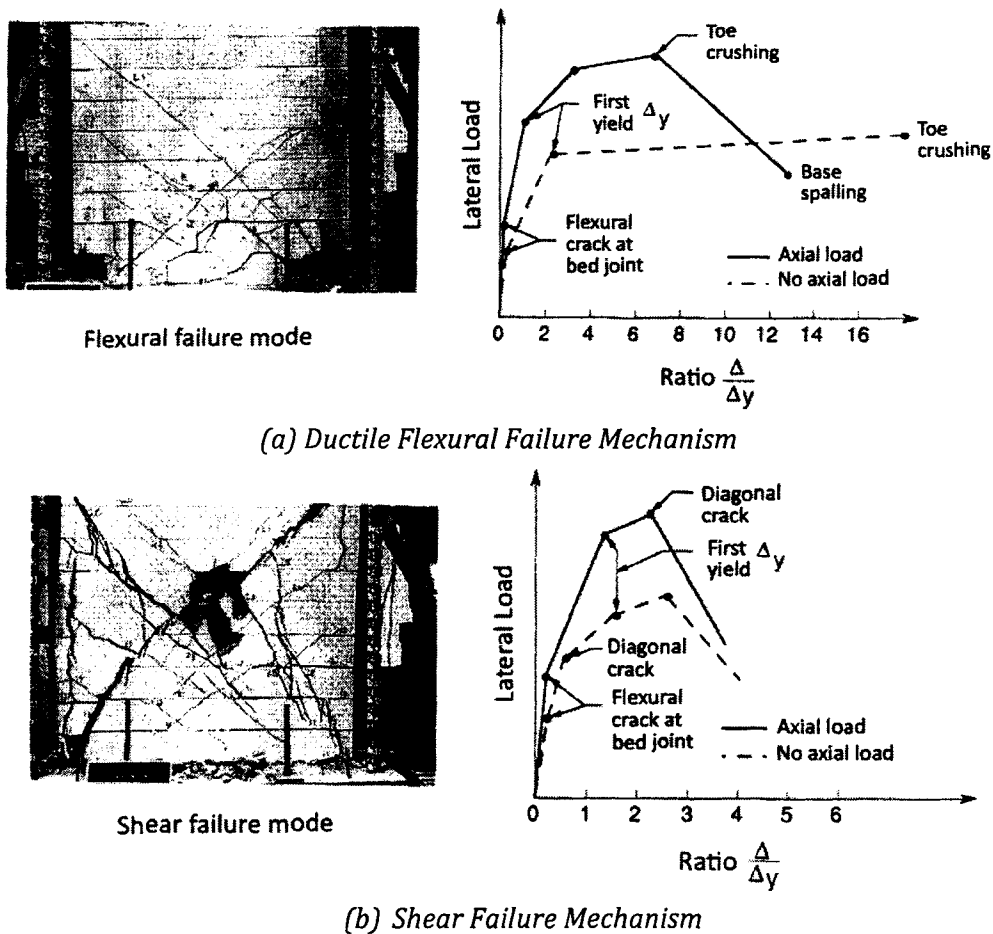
Failure mechanisms of masonry shear walls (from Shing et al. 1989)
